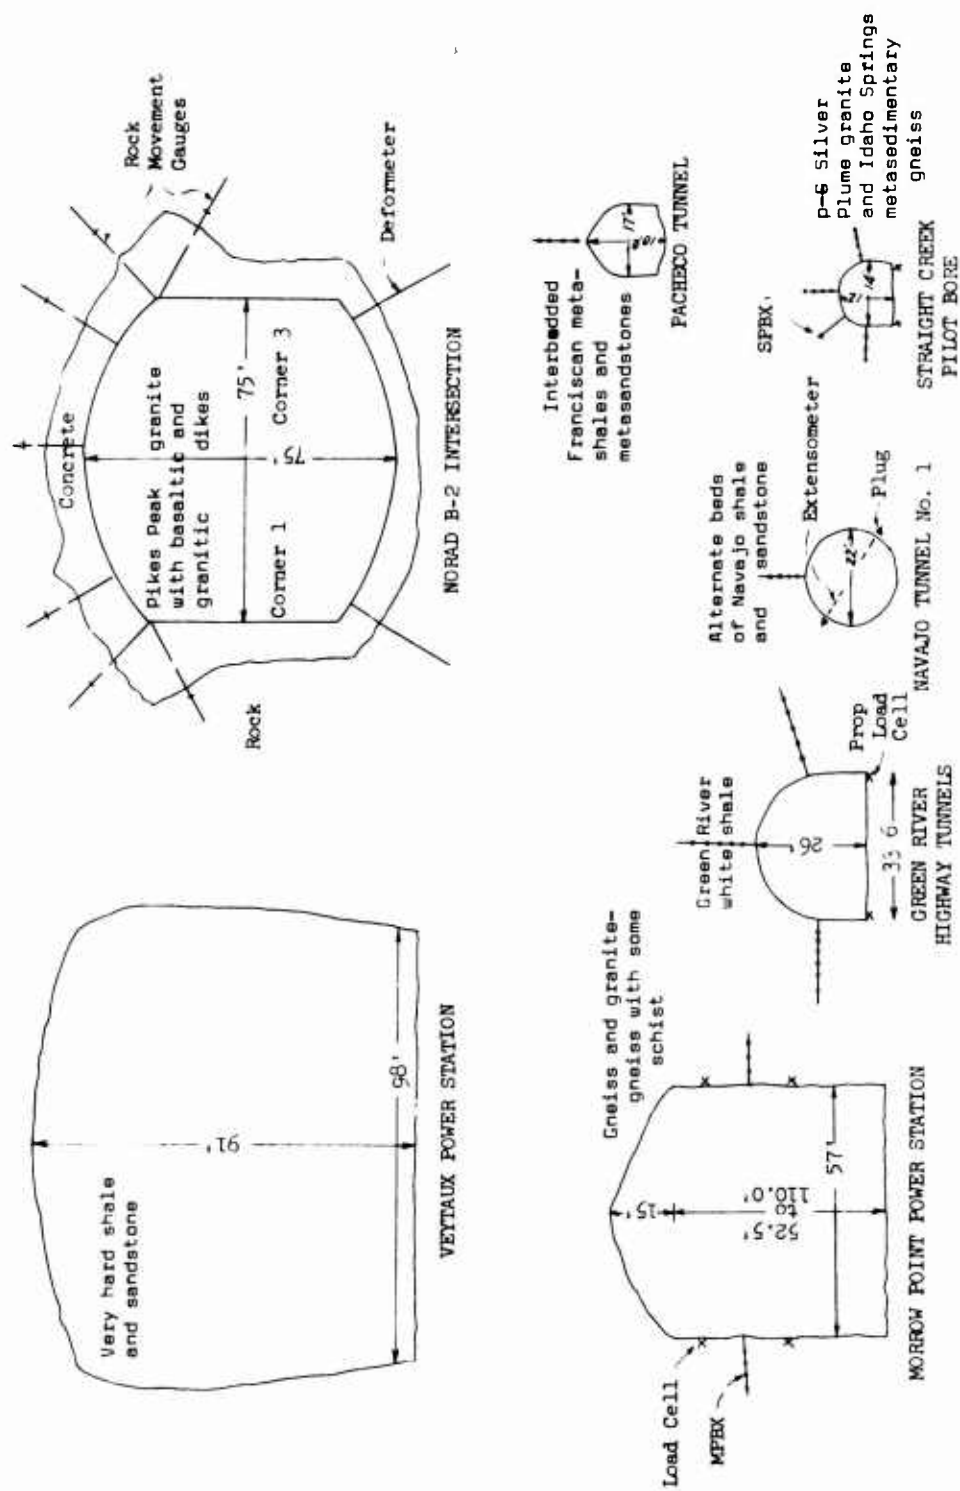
INSTRUMENTED UNDERGROUND OPENINGS
